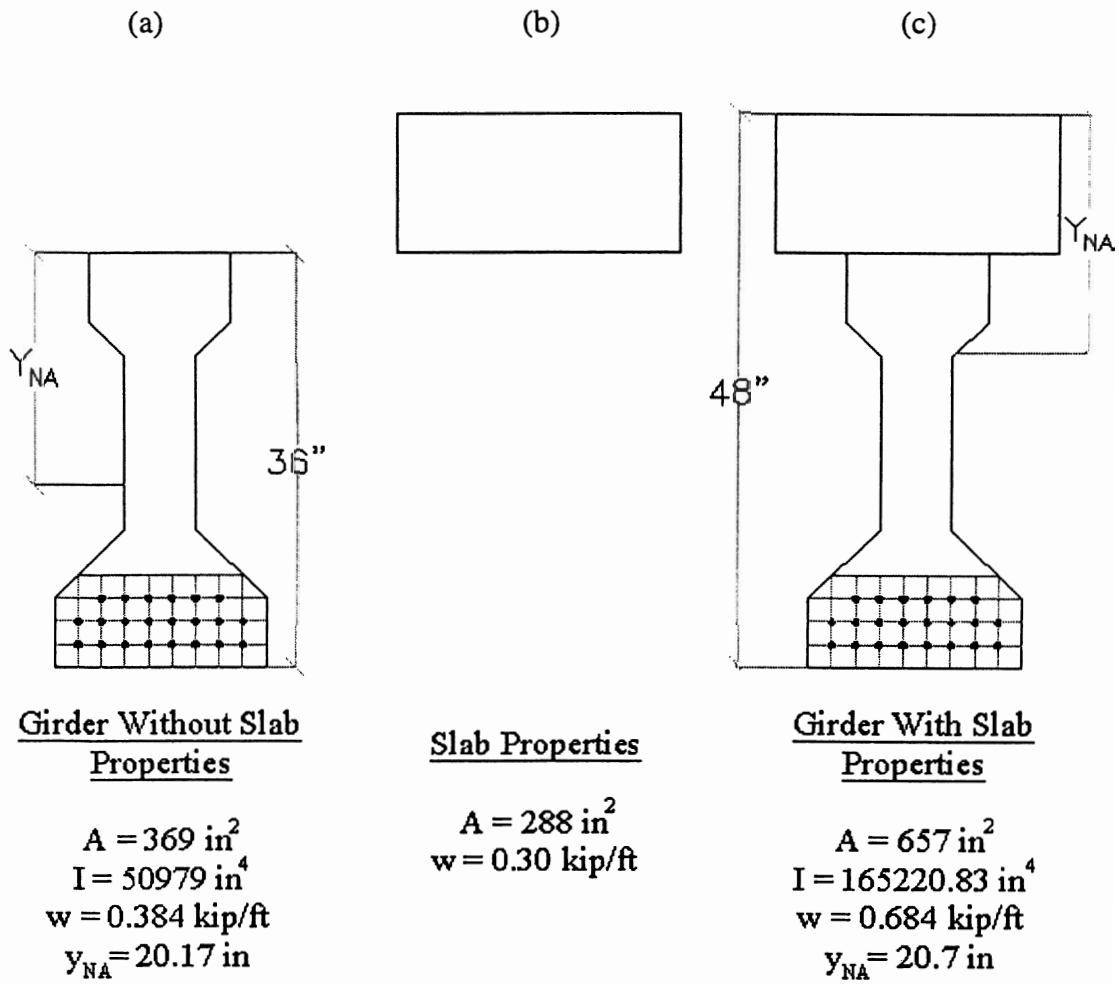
Geometric Properties of the Cross-Section a) Girder without the Slab; b) Slab; and c) Girder with the Slab
